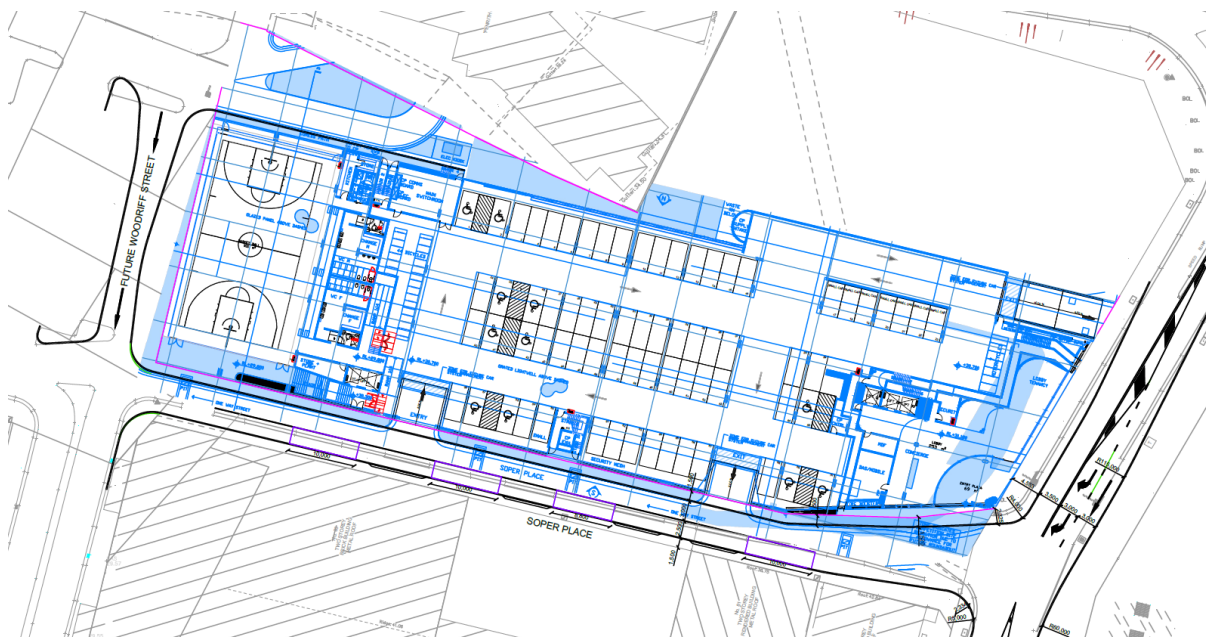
Extract of realigned Soper Place design (Source: Ason Group, Applicant Traffic Engineer)
